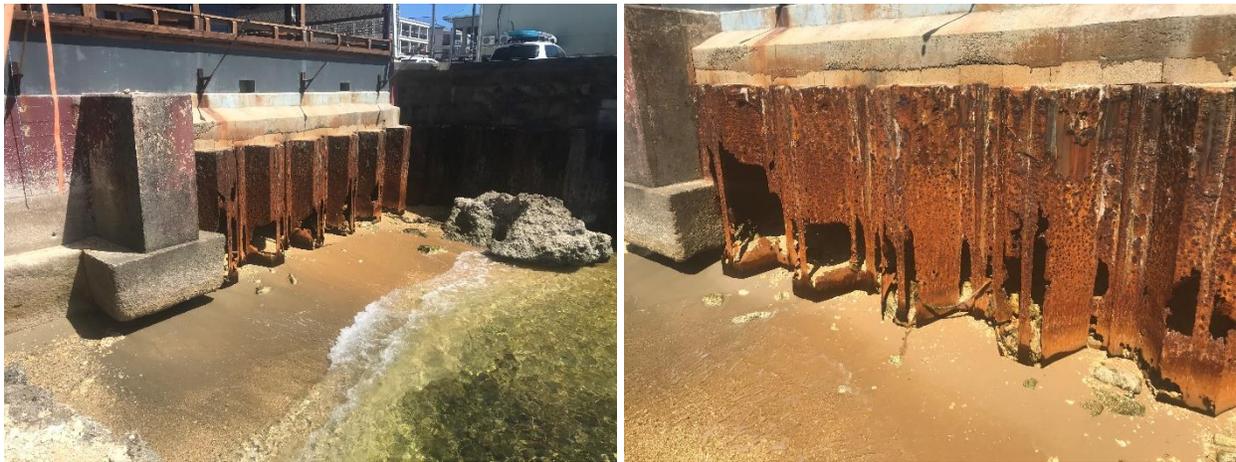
DOE SITE VISIT PHOTOS SHOWING THE DAMAGED SEAWALL (2021)
